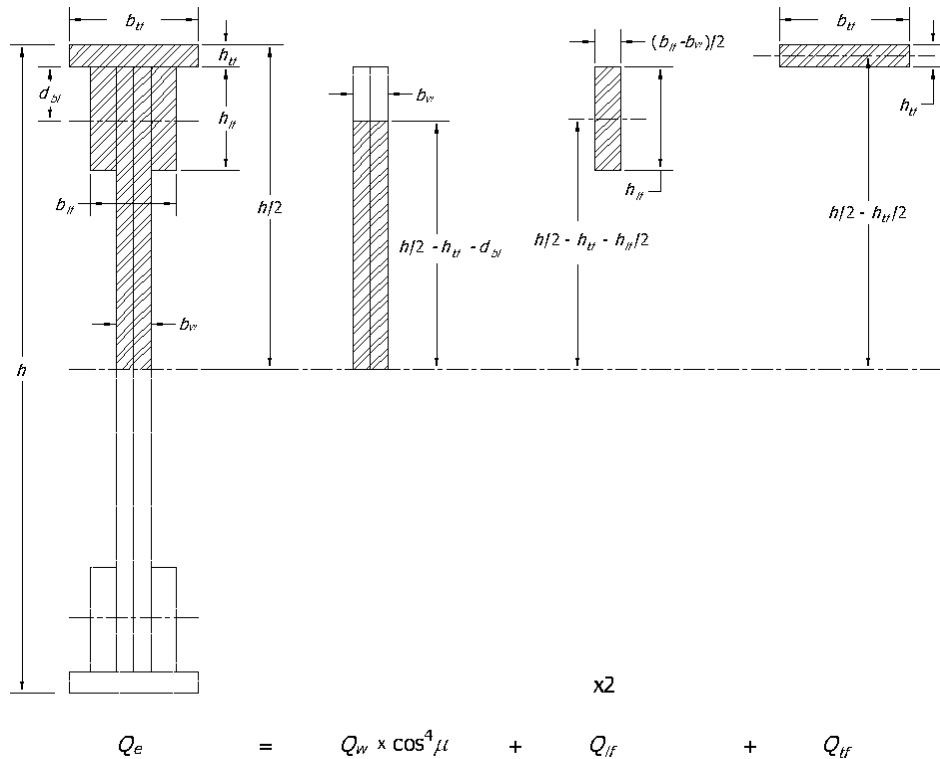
Schematic representation of static moment of area calculation for Allotey girder
